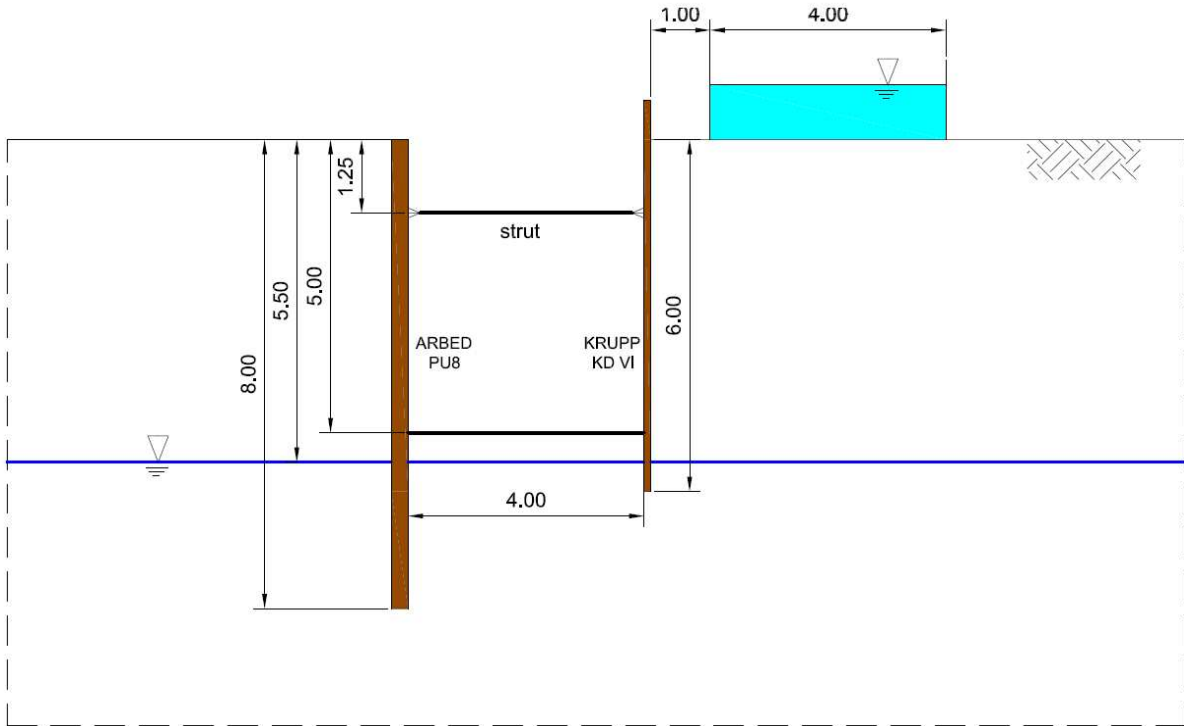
Karlsruhe braced sheetpile excavation: cross-section view.
